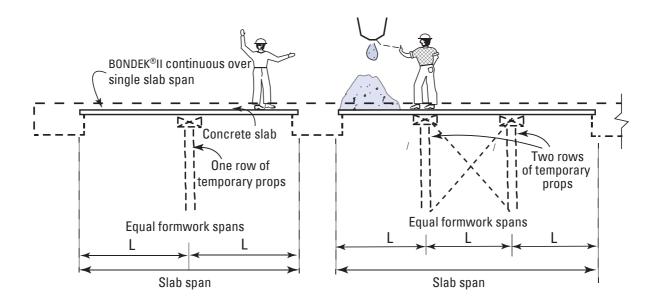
LYSAGHT[®] BONDEK[®] II formwork for concrete frame
